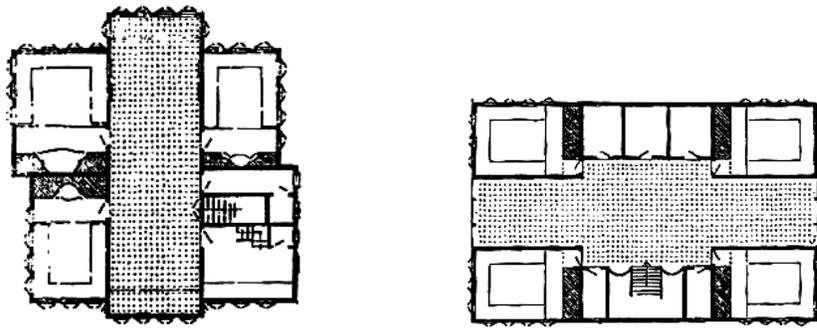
The Plan Type with an Inner Sofa (left) and the Plan Type with a Central Sofa (right). (Eldem, 1954)
